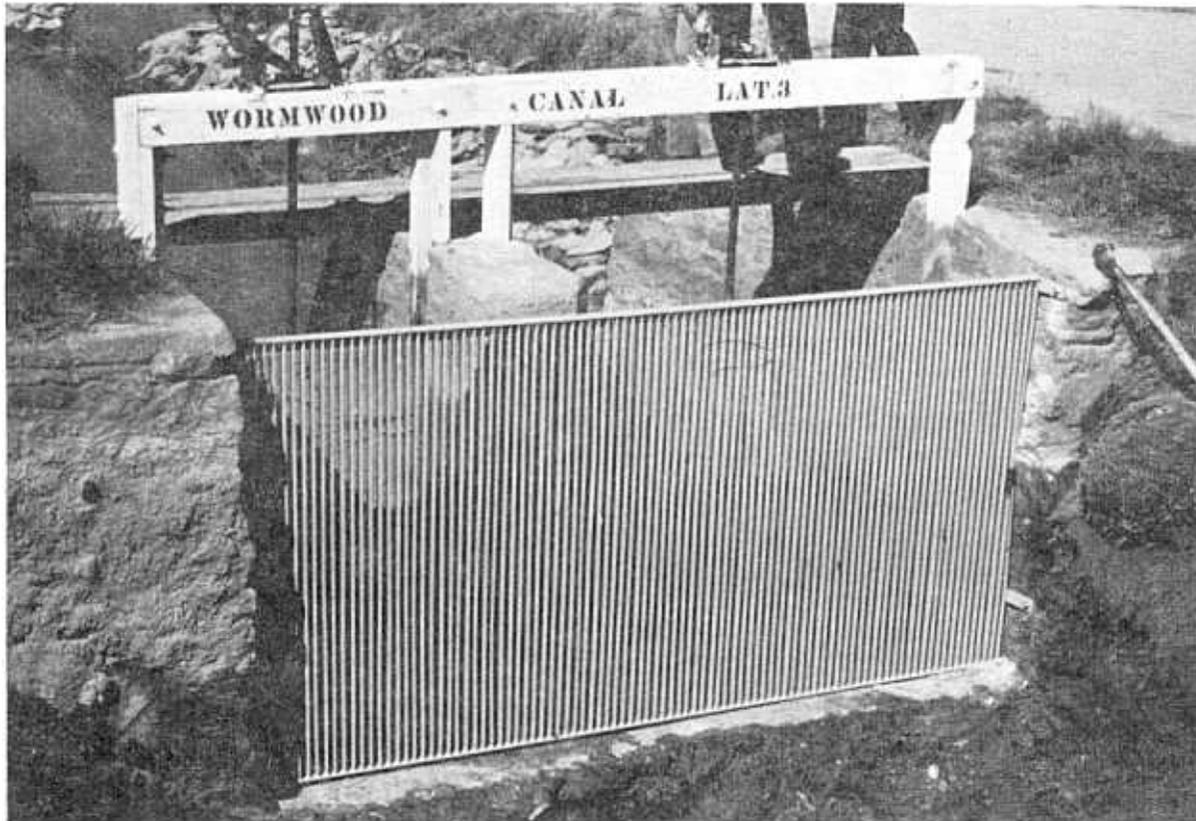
Vertical bar fishscreen between test sections on Wormwood Lateral 3
